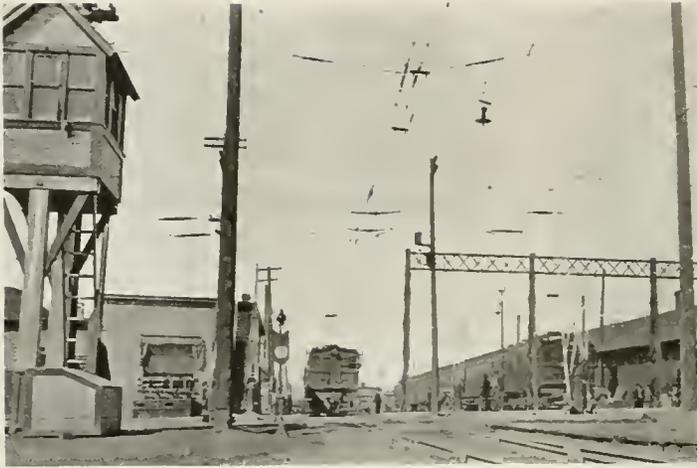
General Arrangement of the Electrical Connections at a Street Railway Crossing
